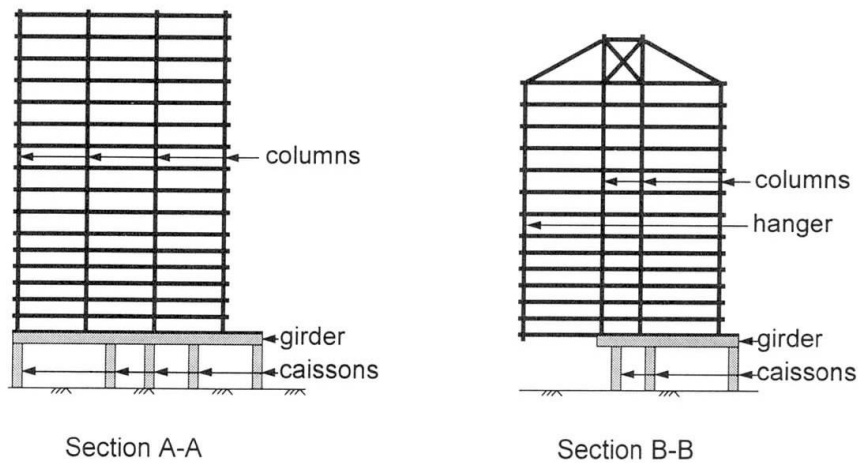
Schematic sections through Morton International Building (see Fig. 4 for location of sections)
